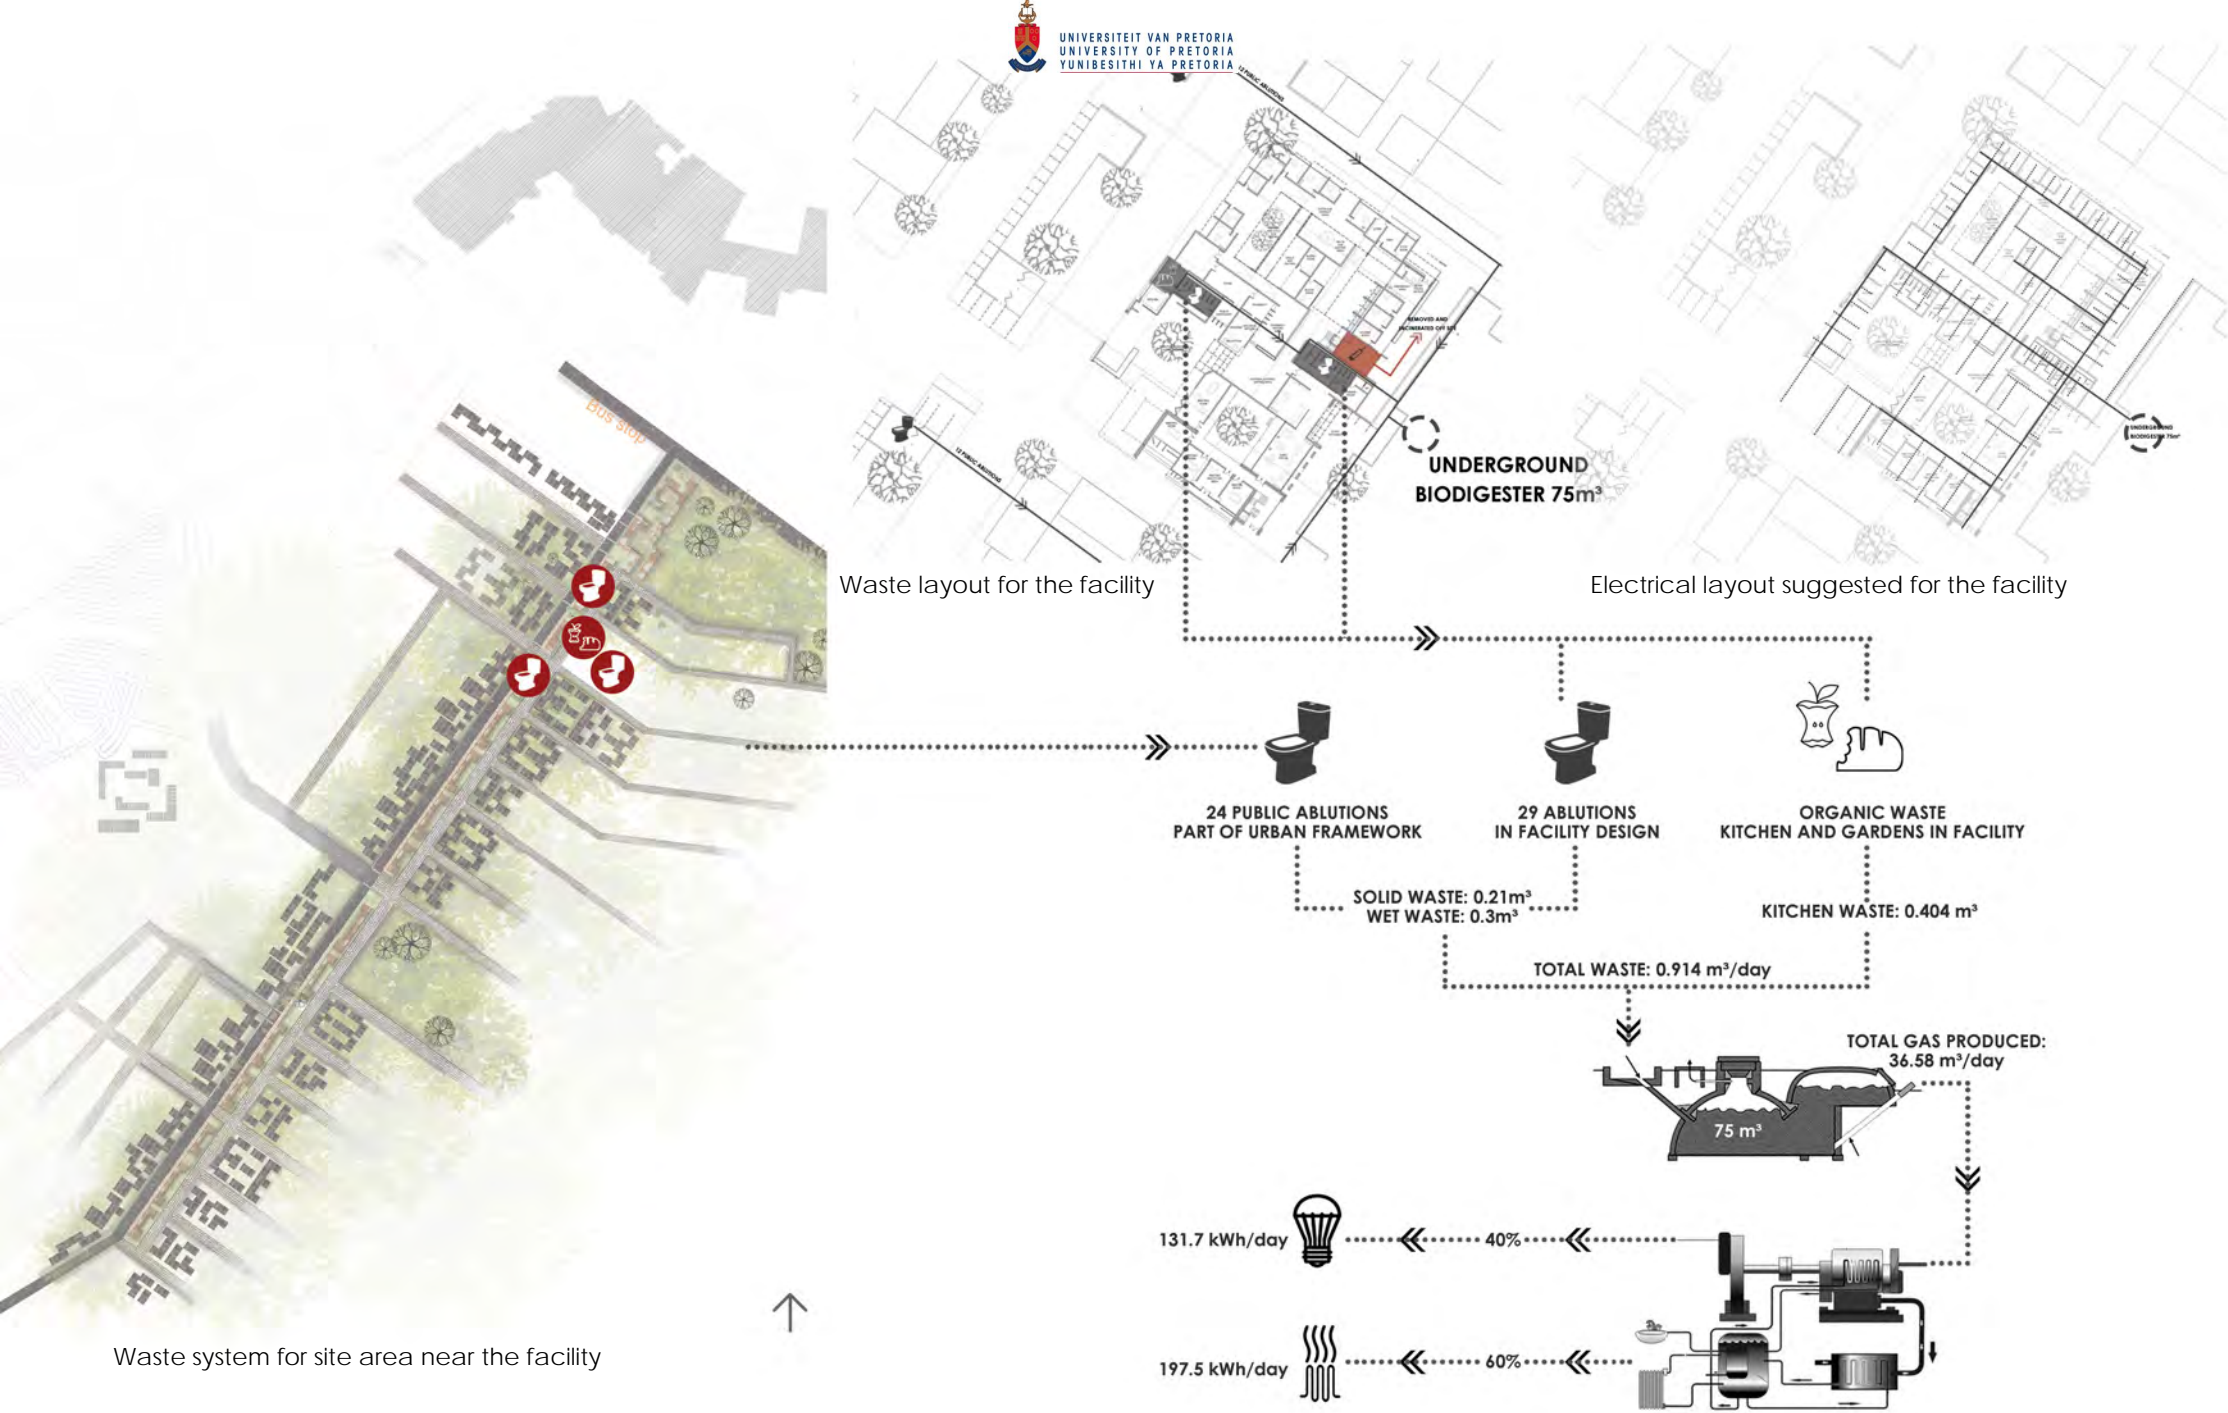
Biodigester system and electrical layout on site (Author 2016).
